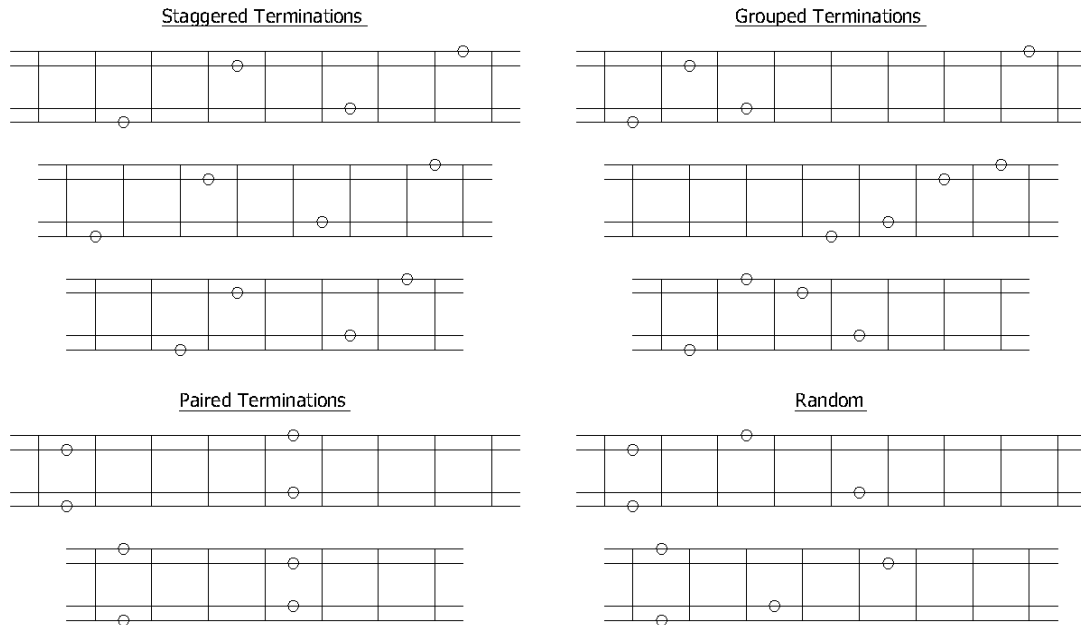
Types of chord termination patterns identified in Town lattice truss bridges
